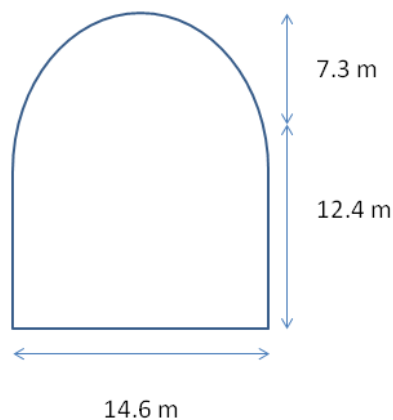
Design of the tunnel cross-section of Songa pump storage hydropower plant.
